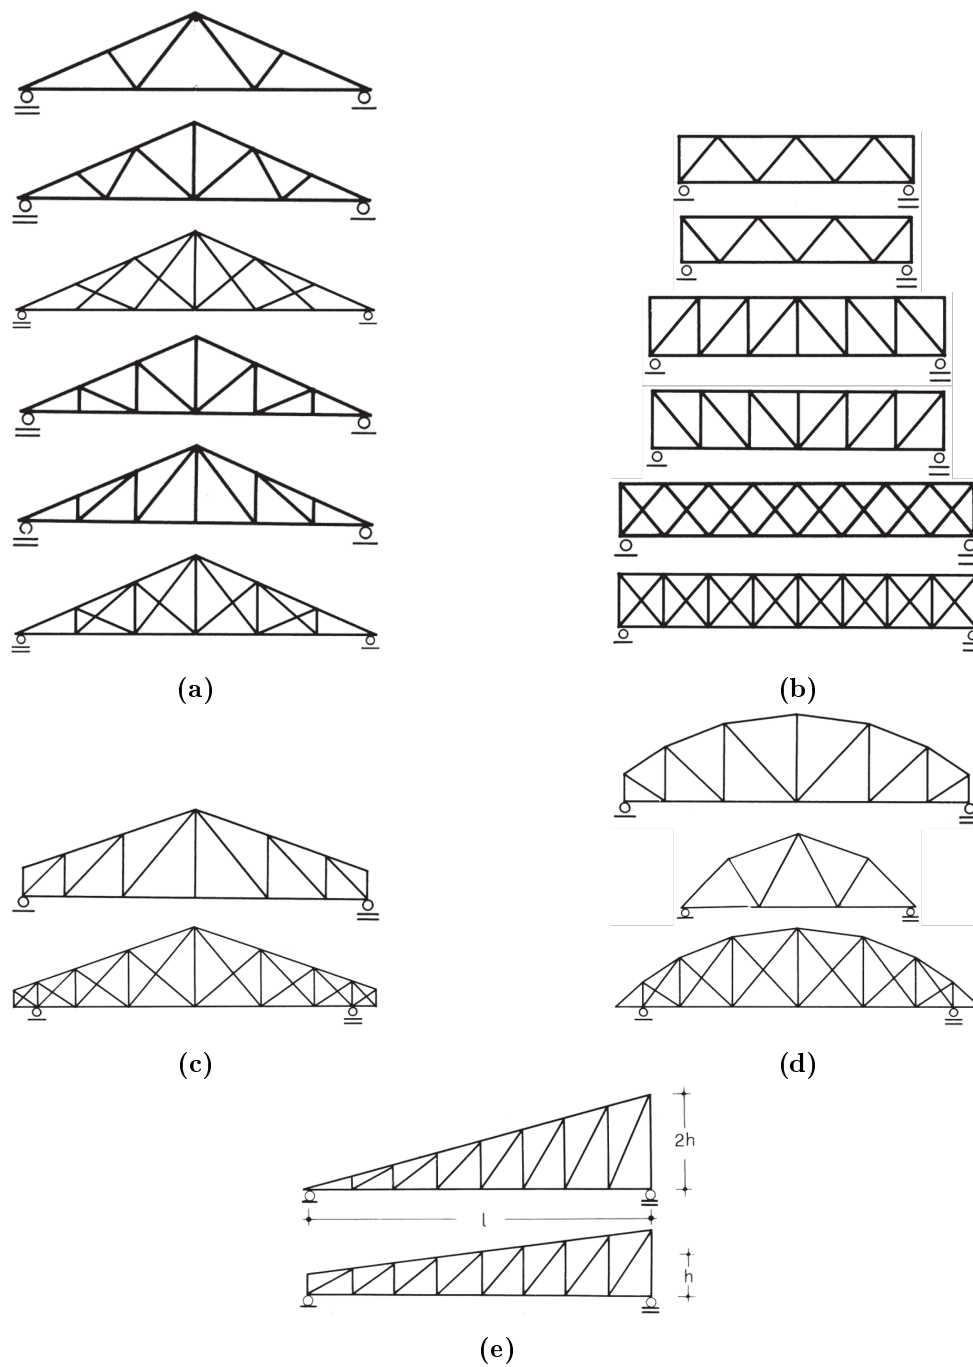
Typical layouts of the web members of timber trusses [61, 99]; (a) triangular trusses; (b) parallel chord trusses; (c) dupitch roof trusses; (d) arched roof trusses; (e) monopitch roof trusses.
